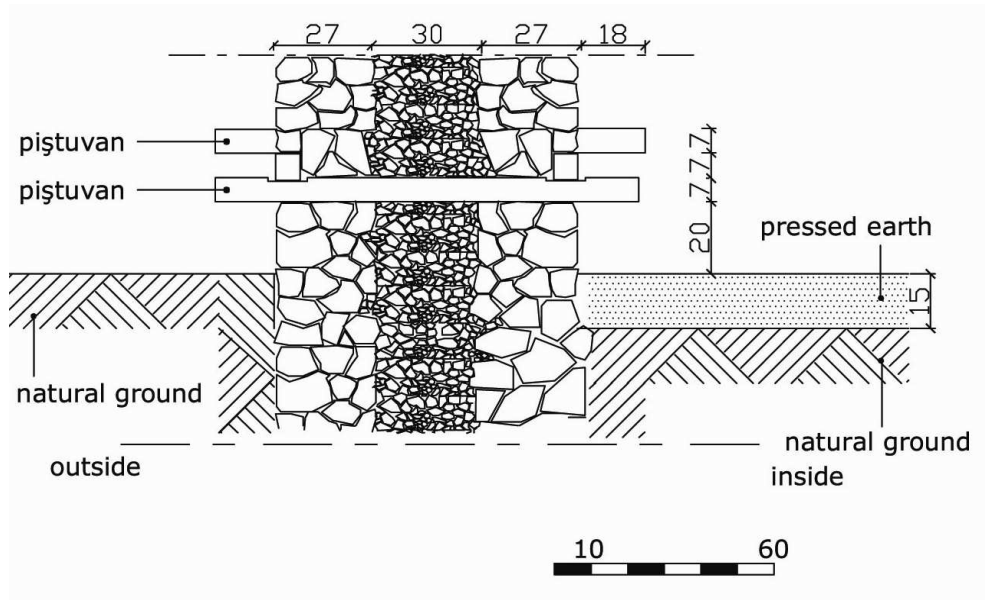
26 Drawing of the section of the earth floor. Çelik 2008.
